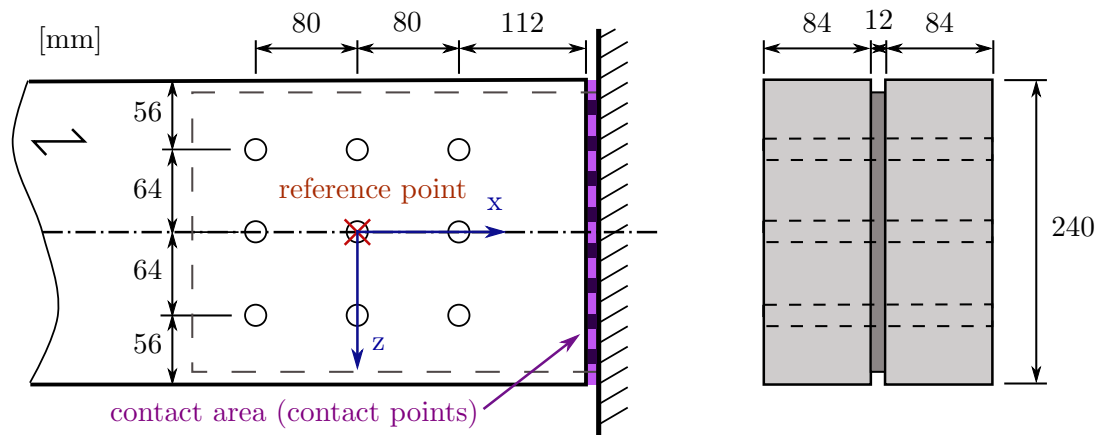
Elevation (left) and cross section (right) of the centric connection, including a contact condition.
